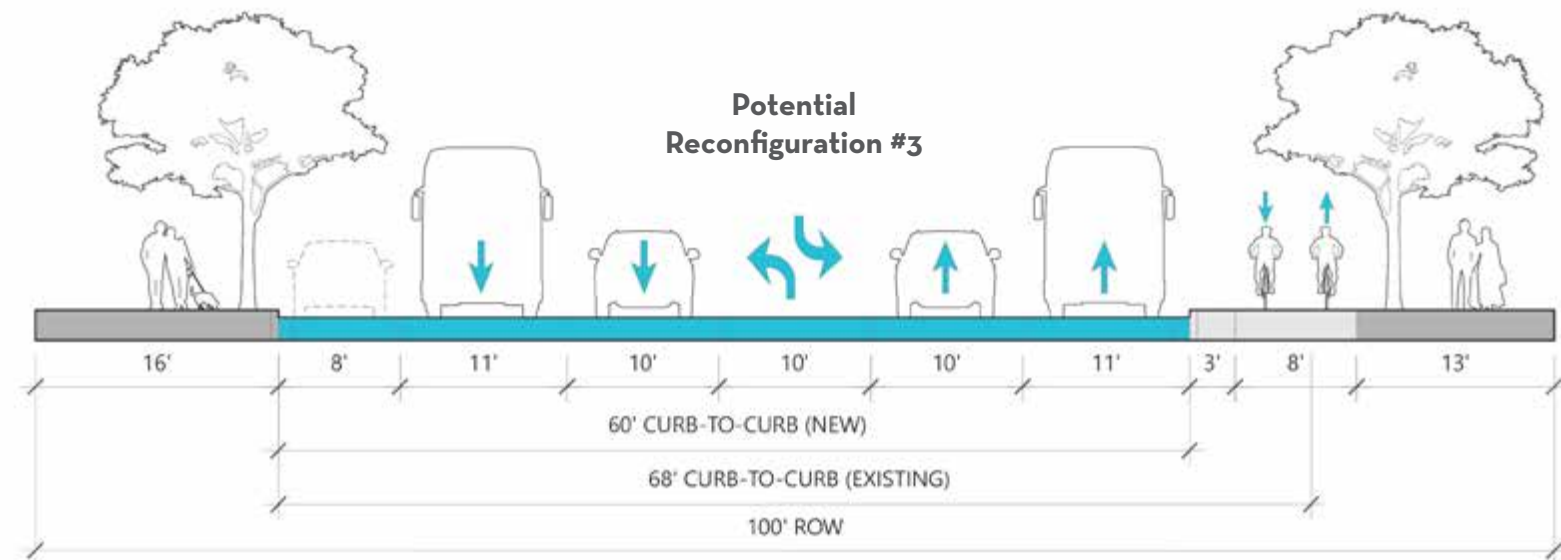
Potential Reconfiguration #3: Two-Way, Sidewalk-Level, Class IV Bikeway along an Arterial Street. See Chapter 8D-1 Roadway Reconfigurations for minimum travel lane widths.
